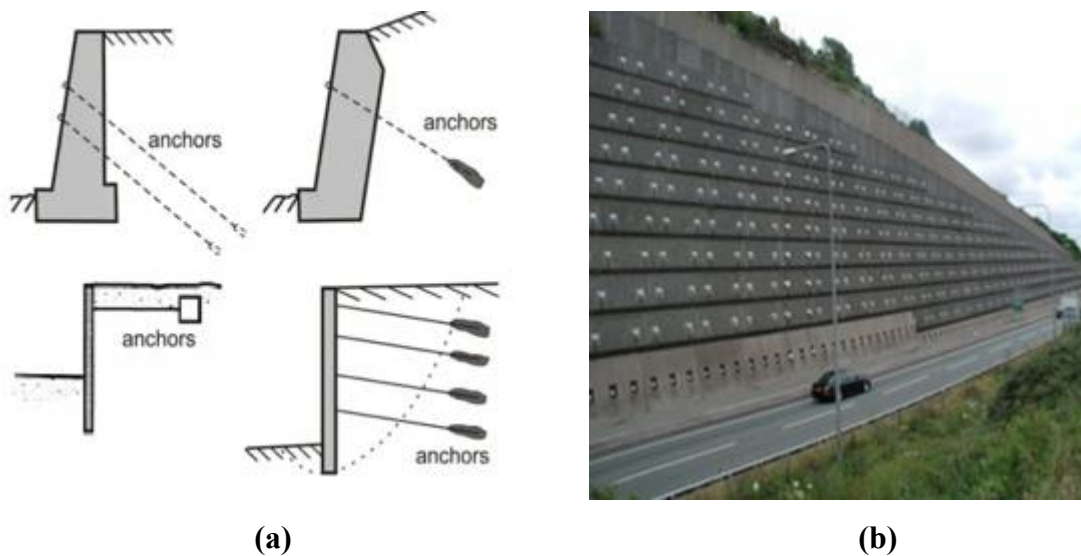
Anchored walls (a) Plan view (b) Example (theconstructor.org).
